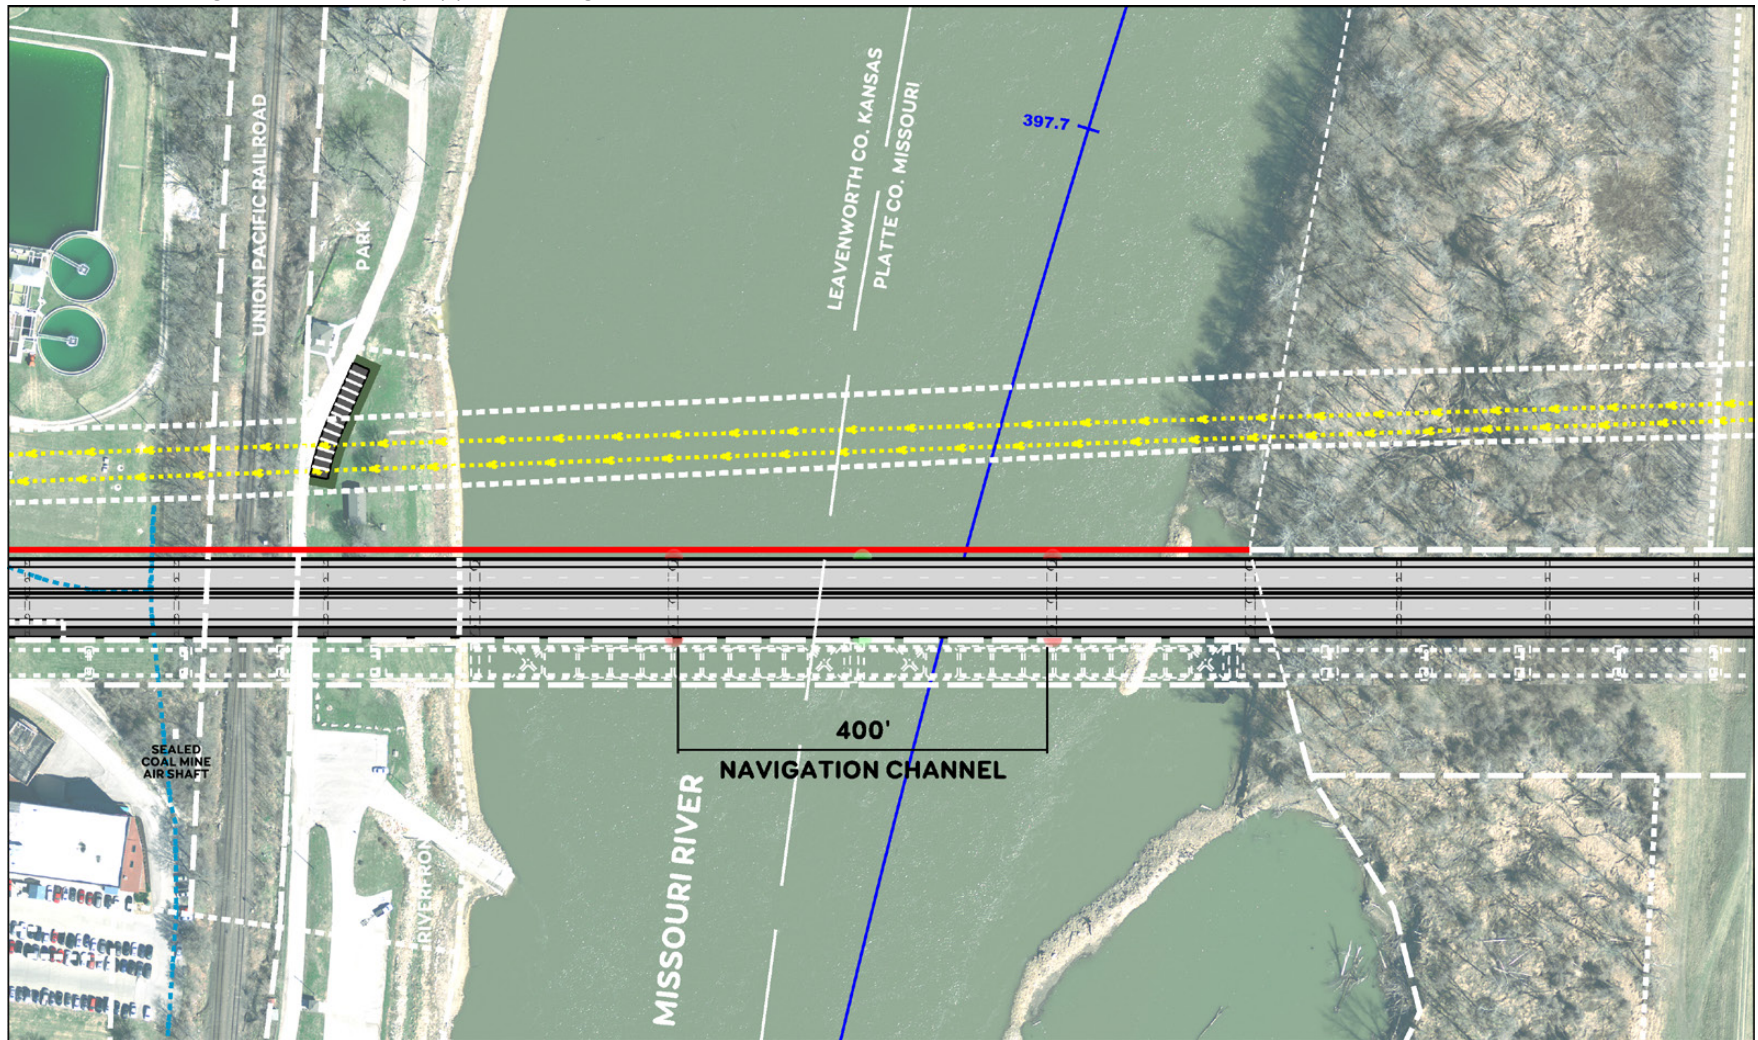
| Bridge and Roadway Approach Alignment (Part 1 of 4)
